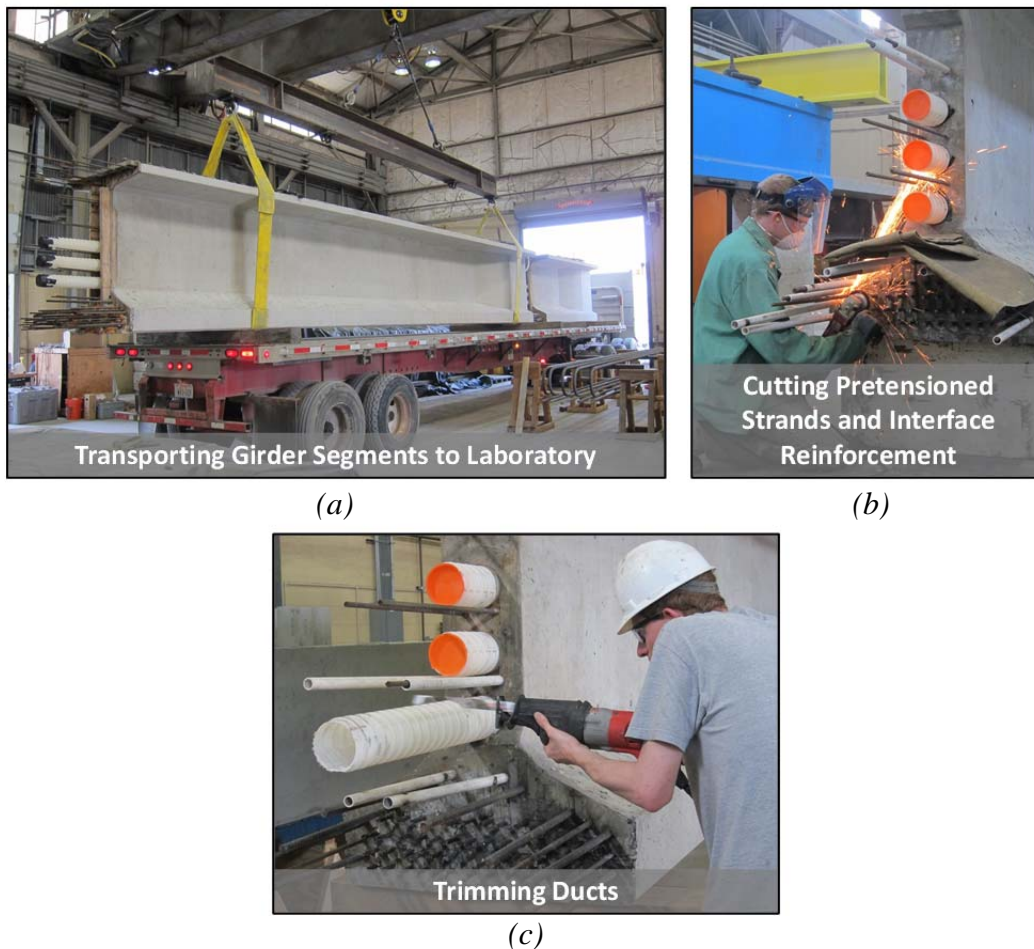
Preparing precast segments – (a) transporting girder segments to laboratory; (b) cutting pretensioned strands and interface reinforcement; (c) trimming ducts
